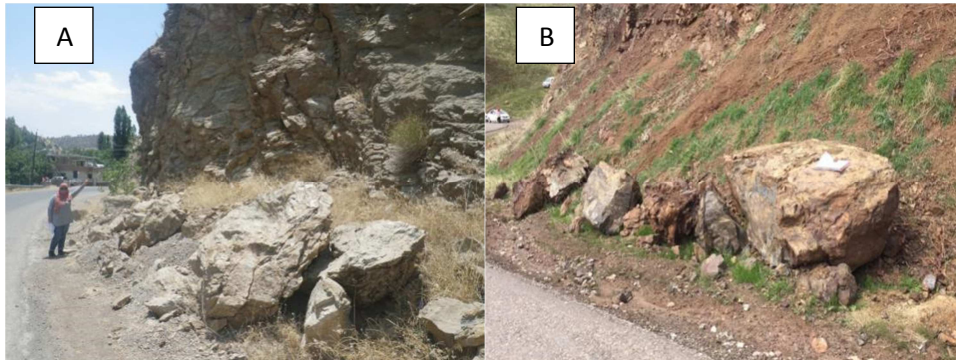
a, shows a large block fall at site No. 24 b, shows a large block fall at site No. 19
